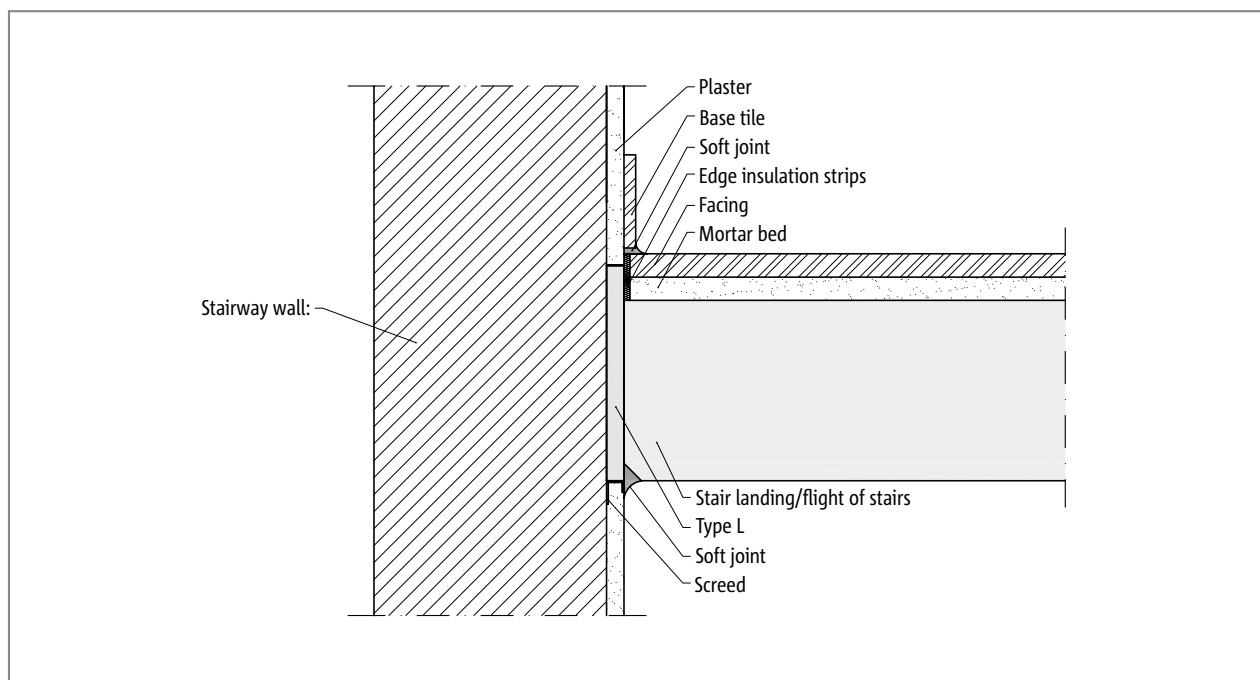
Schöck Tronsole® type L: Installation cross-section precast landing
